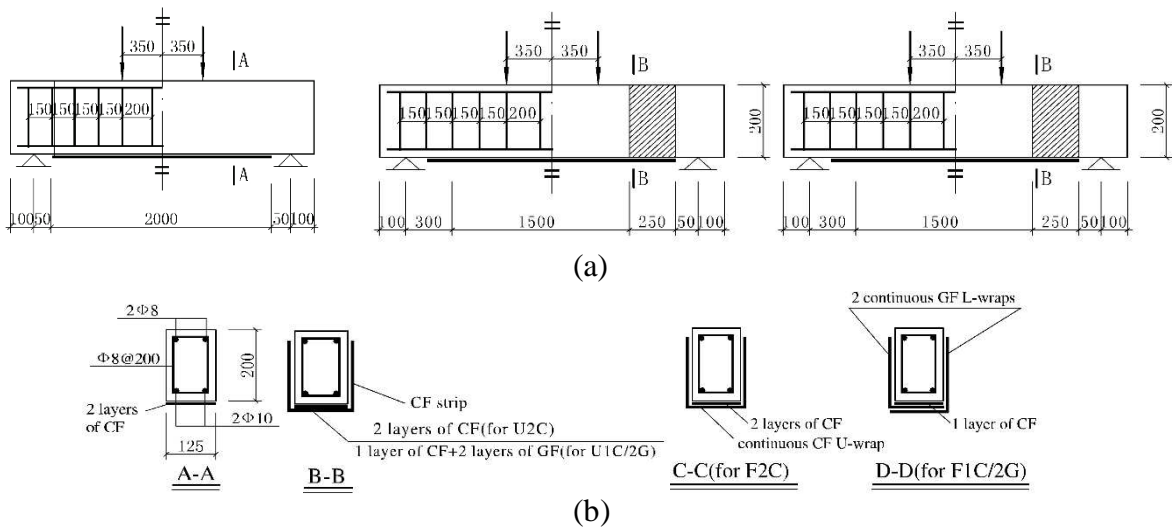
Configurations, test setup and strengthening layouts of the beams tested by Xiong et al [34], (a) lateral views, and (b) cross-sections
